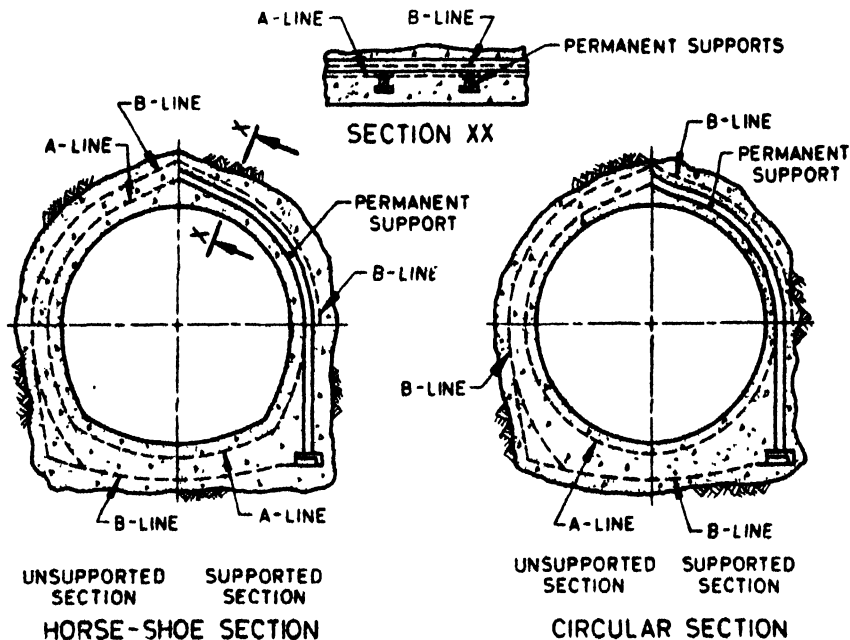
TYPICAL SECTIONS OF CONCRETE LINED TUNNELS
